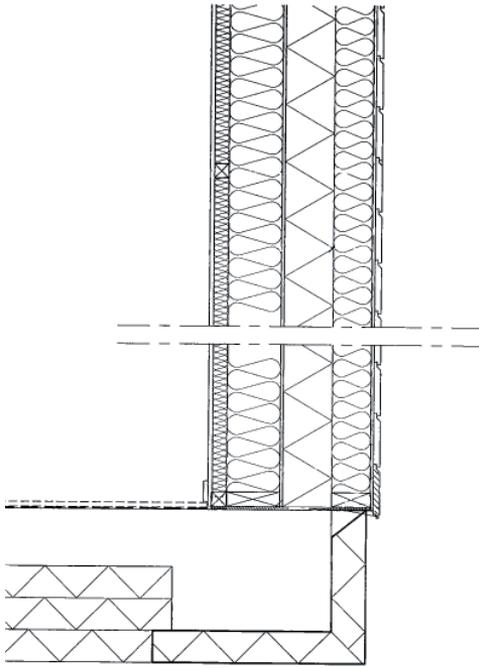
Foundation construction (Drawing: Vårgårdahus).
